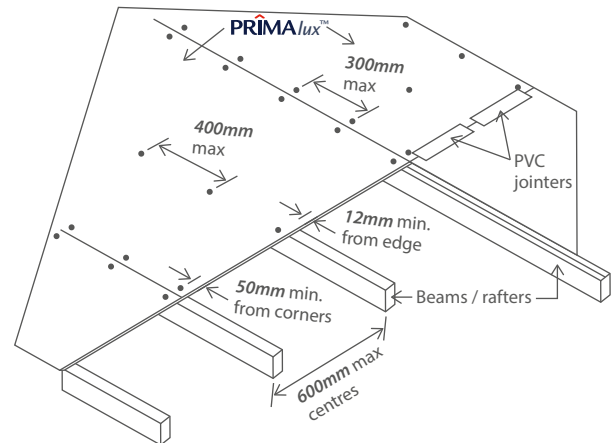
PRIMA^{lux}™ Exposed Beam Ceiling
